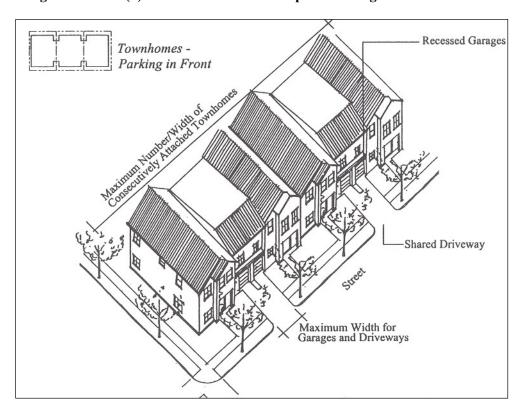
E(3) - Townhomes and Multiplex Housing With Street Access
